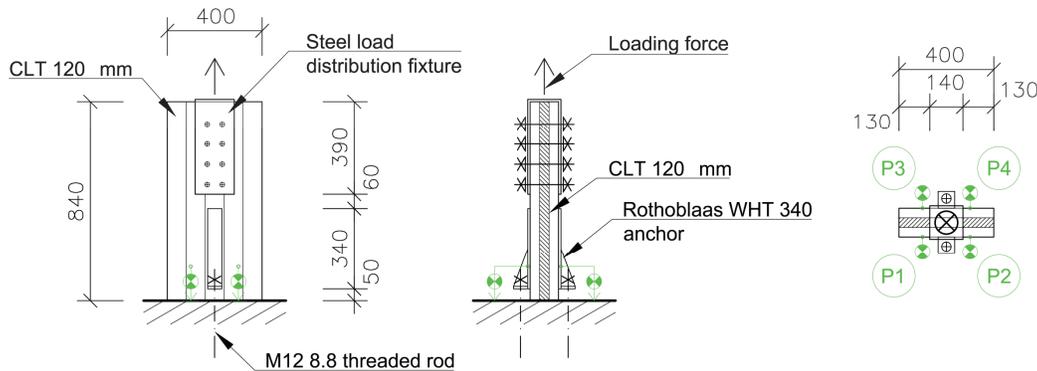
Loading test setup for tensile anchors – side views (left, middle) and plan view (right).
